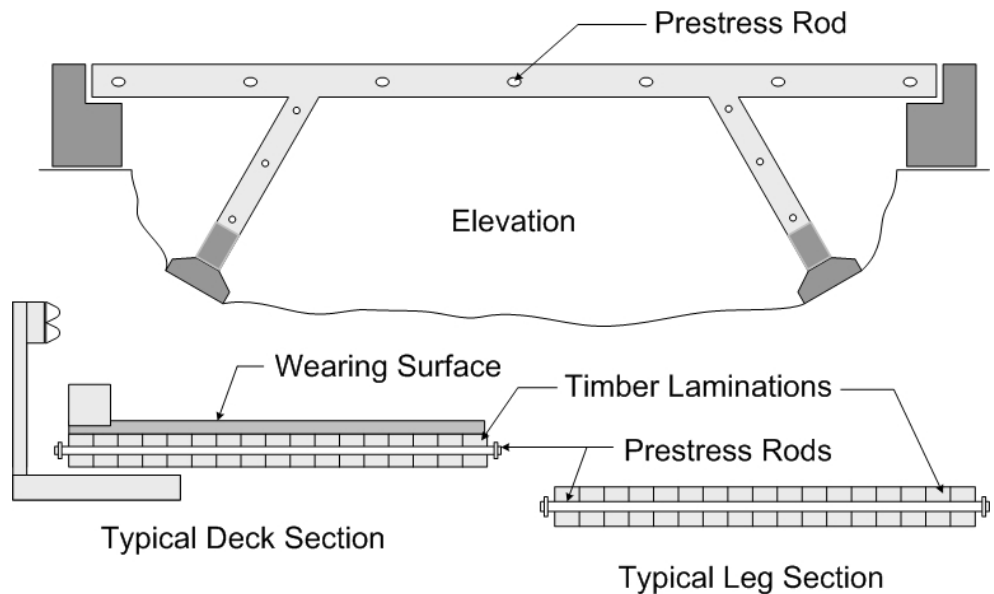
Stress-Laminated Timber K-frame Bridge
